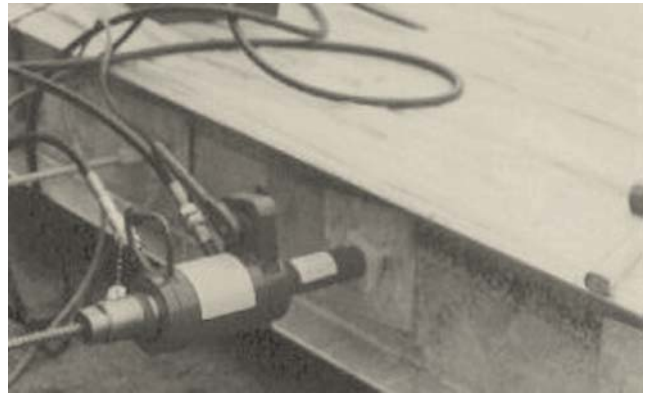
Steel channel and discrete plate bar anchorage configuration.
